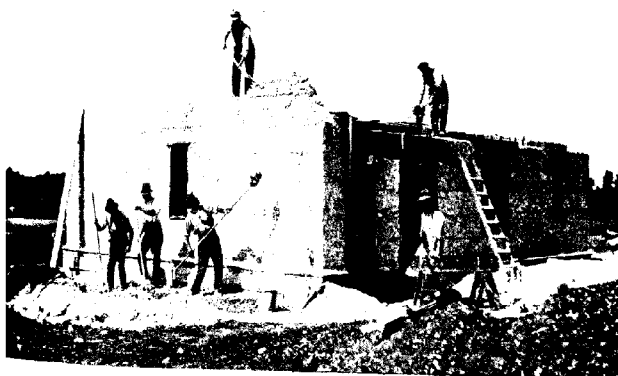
Chalk Cob. Chalk walling in process of erection. Traditional method.
